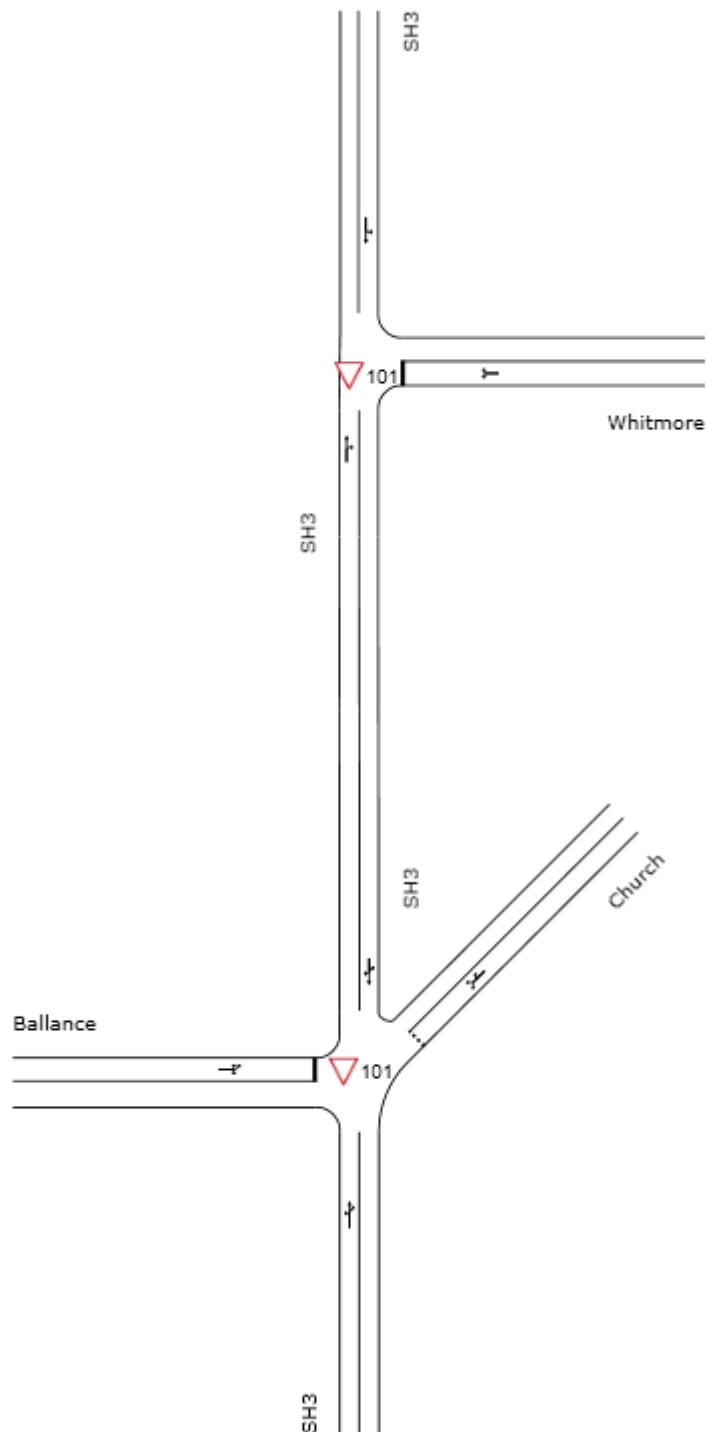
Sidra Intersection Diagram – State Highway 3 / Whitmore Street / Church Street / Ballance Street
